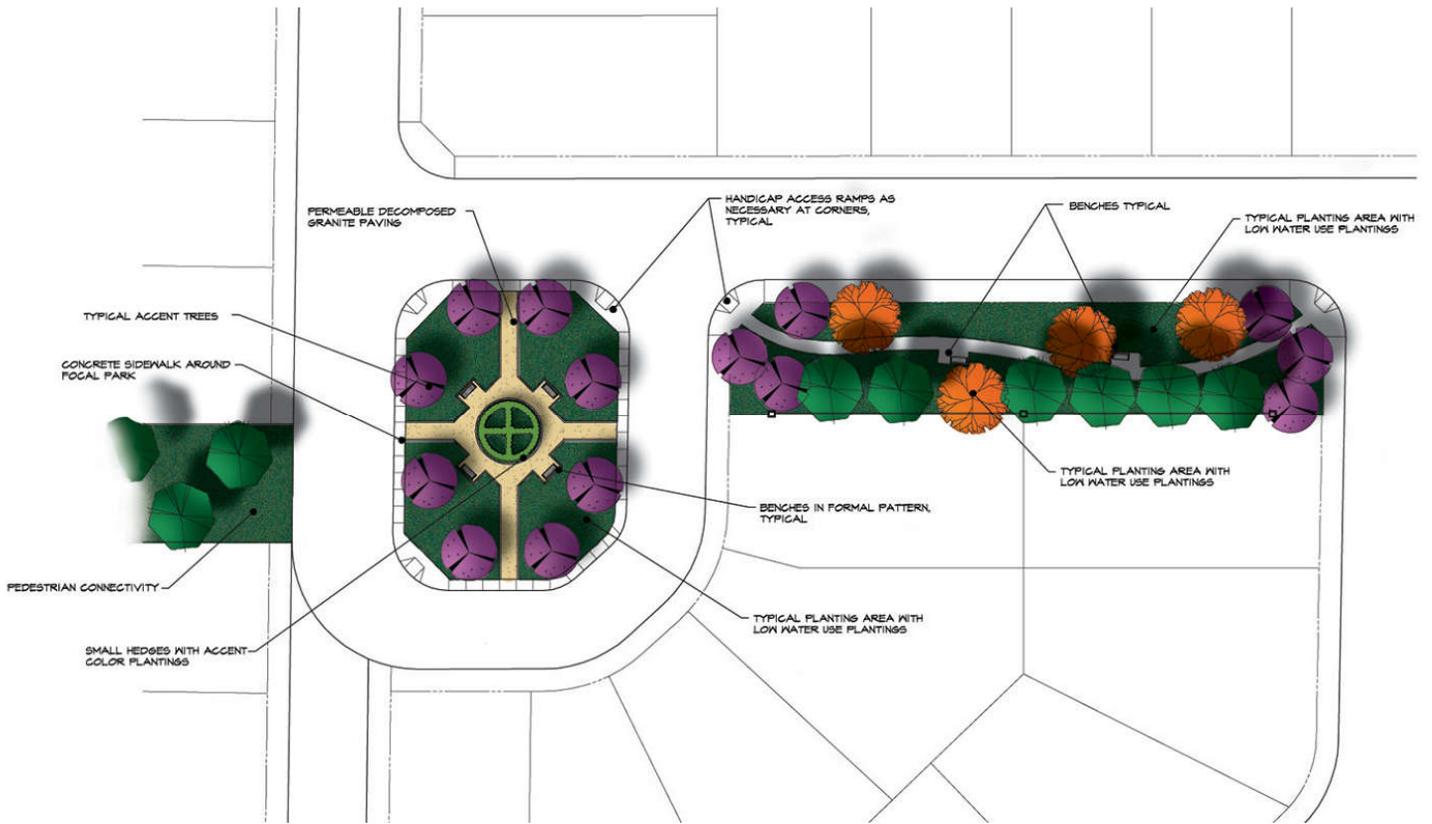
CONCEPTUAL CENTRAL GREEN PLAN
